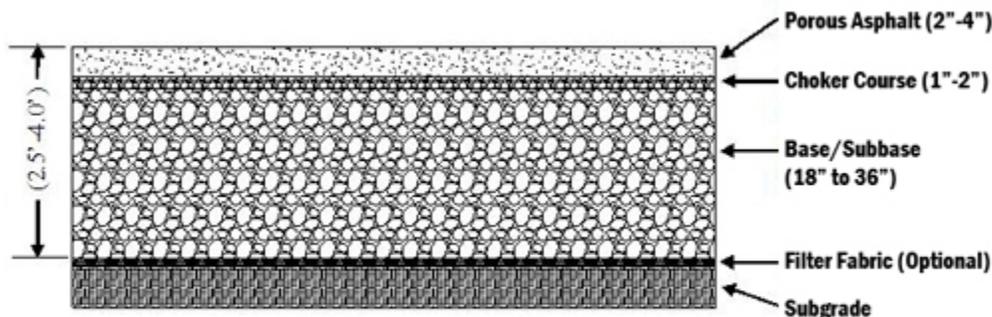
Typical Porous Asphalt Pavement Section (diagram adapted from US EPA)
